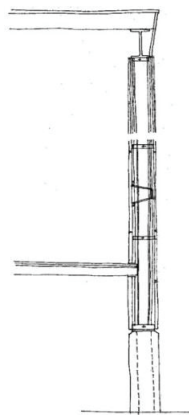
Steiff Factory facade section (Source:Alessi, 2008).
